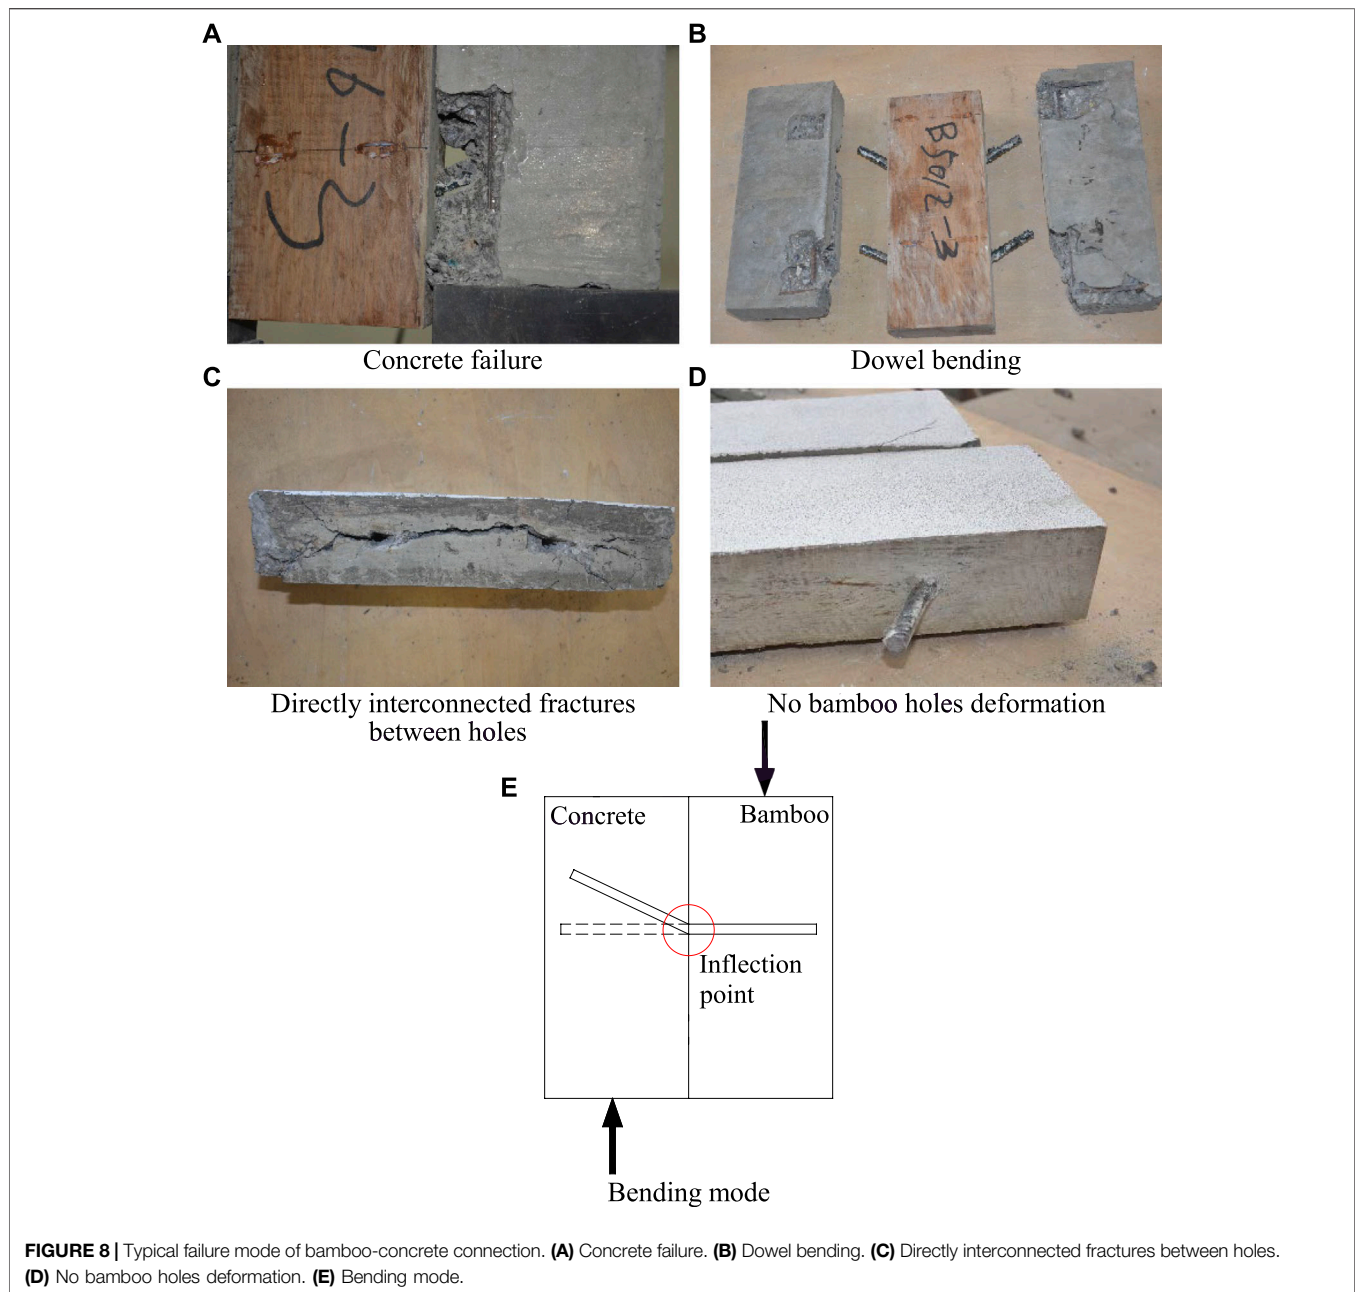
| Typical failure mode of bamboo-concrete connection. (A) Concrete failure. (B) Dowel bending. (C) Directly interconnected fractures between holes. (D) No bamboo holes deformation. (E) Bending mode.
